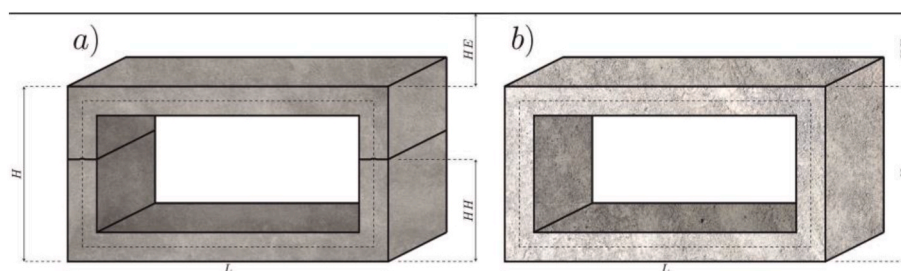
Structural typologies and geometric descriptors of road frames: (a) precast modular hinged frame (PRCAF); (b) in-situ reinforced concrete frame (ISRCF).
